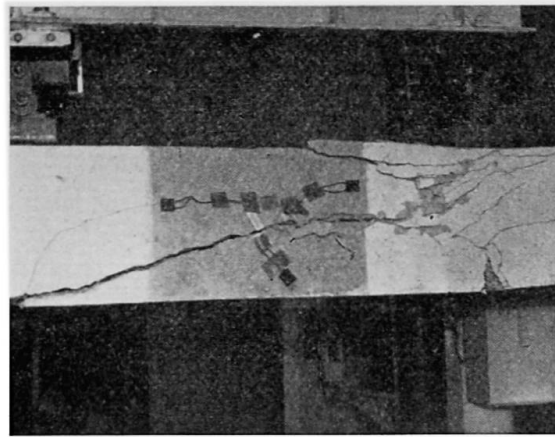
Bending failure of a prestressed concrete hollow beam subjected to a twisting moment =  $1/6$  of bending moment.
